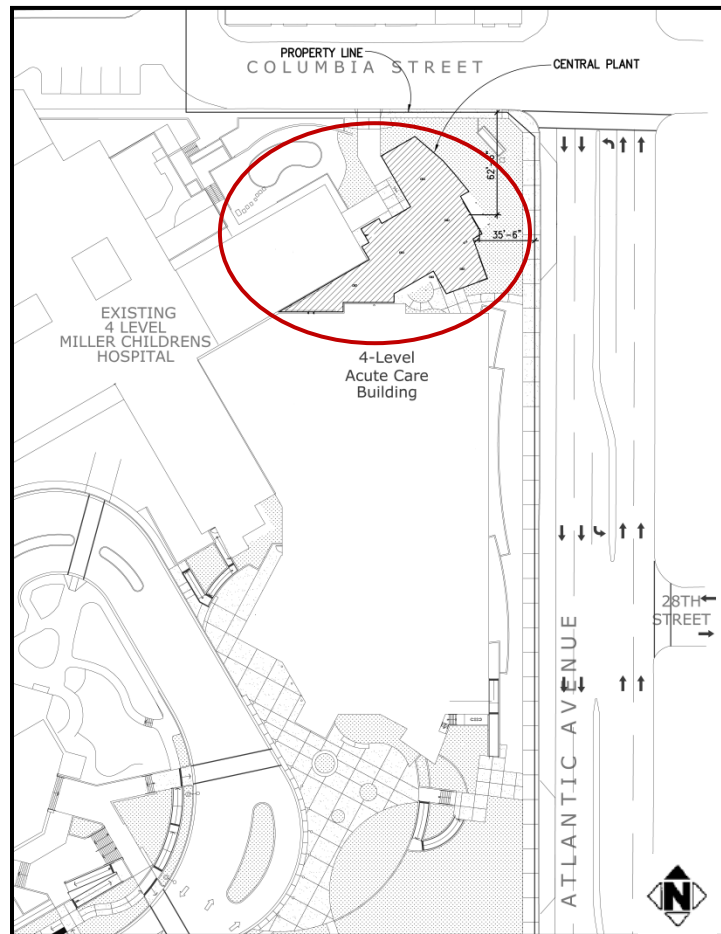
shows the central plant (circled in red) of the Pediatric Inpatient Addition. The tower is just adjacent to the central plant with the existing Miller Children’s Hospital as shown.
